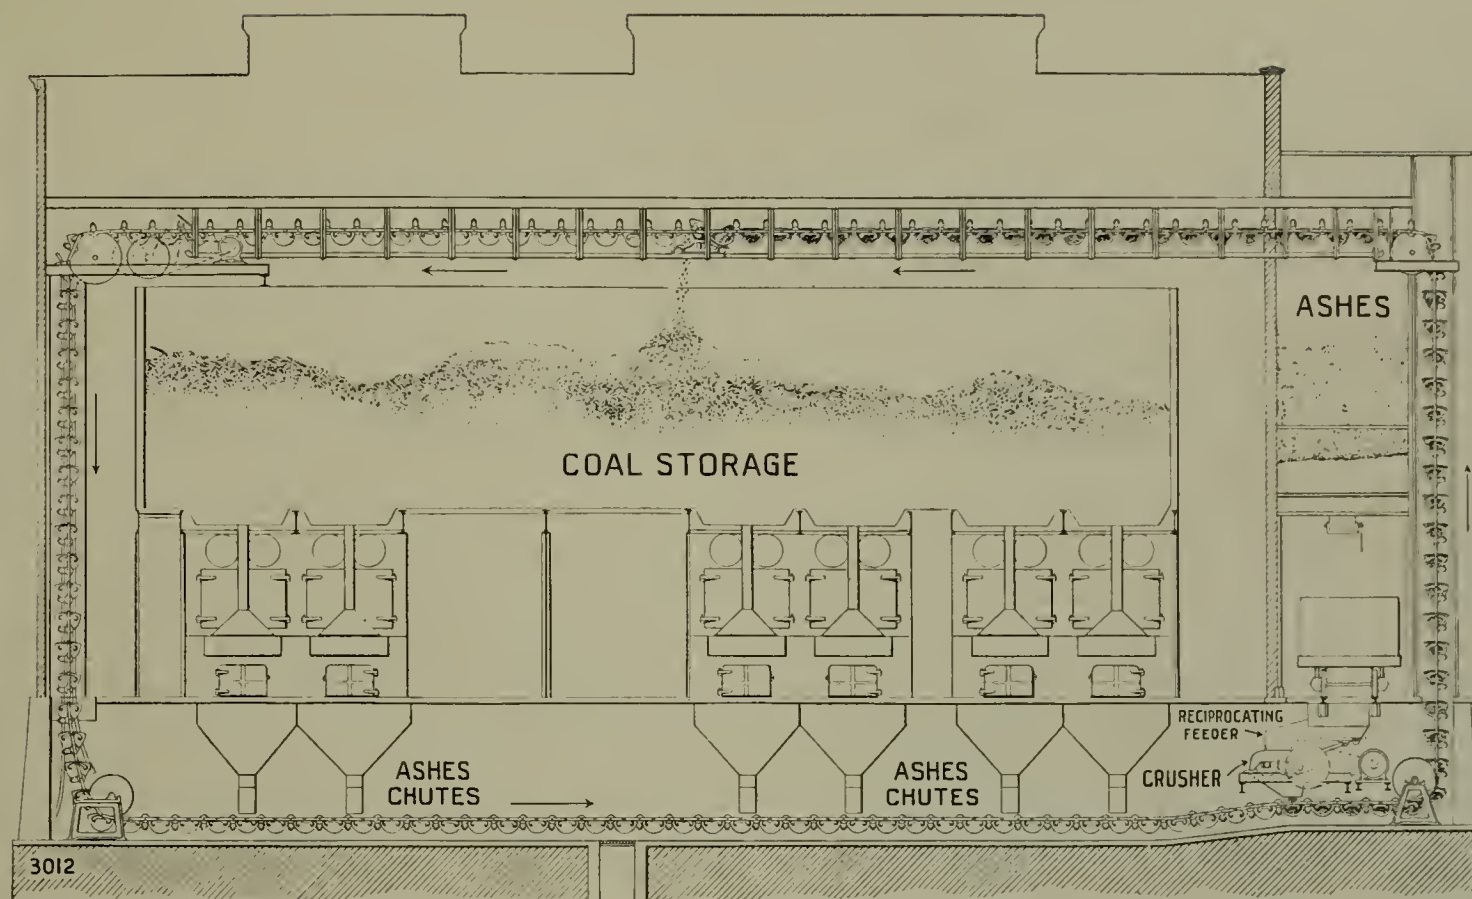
A SECTIONAL VIEW OF THE POWER HOUSE, SHOWING THE ARRANGEMENT FOR HANDLING COAL AND ASHES
